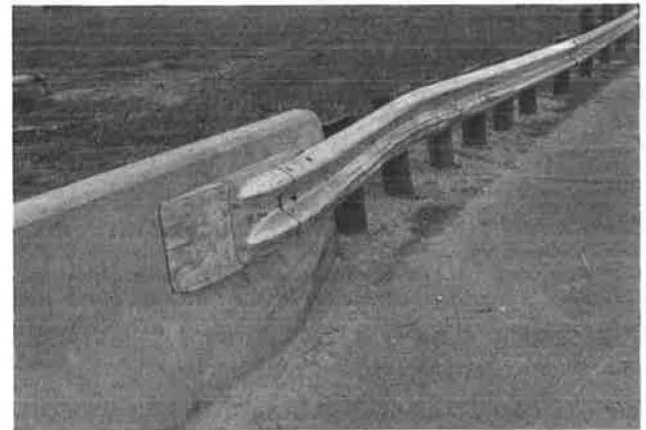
Tubular W-beam transition to CSSB, Test 2 installation.
